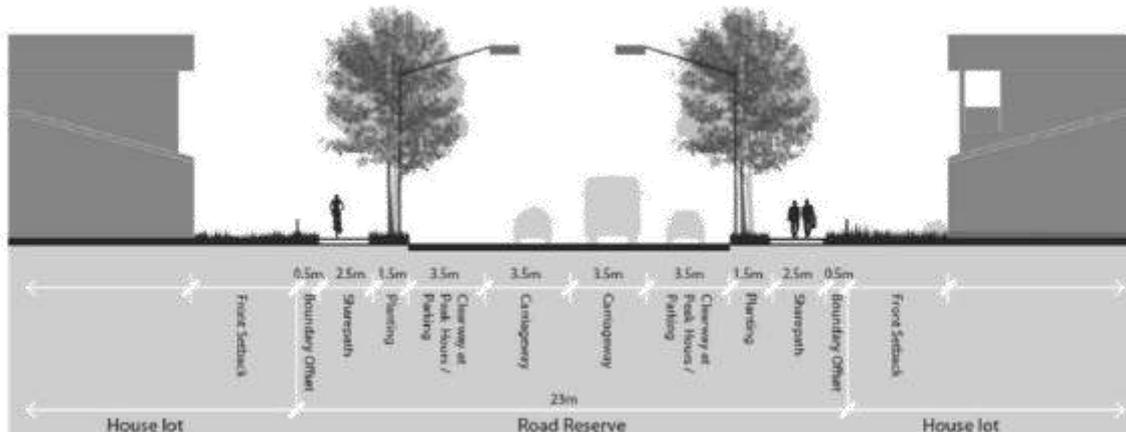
Indicative Rickard Road Transit Boulevard section
